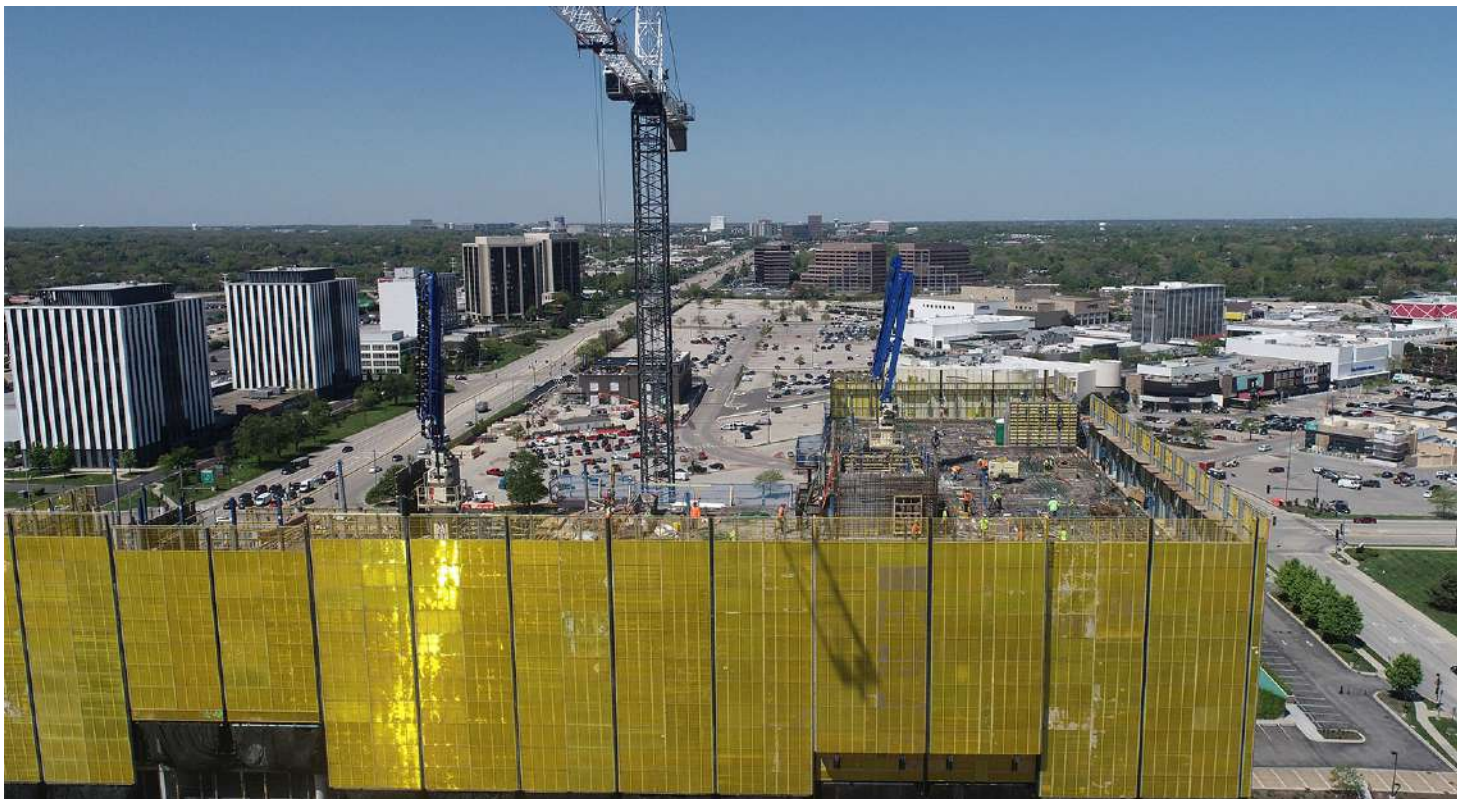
O'Neil Building - managing a construction site is easier with aerial drone maps on PIX4Dcloud.
